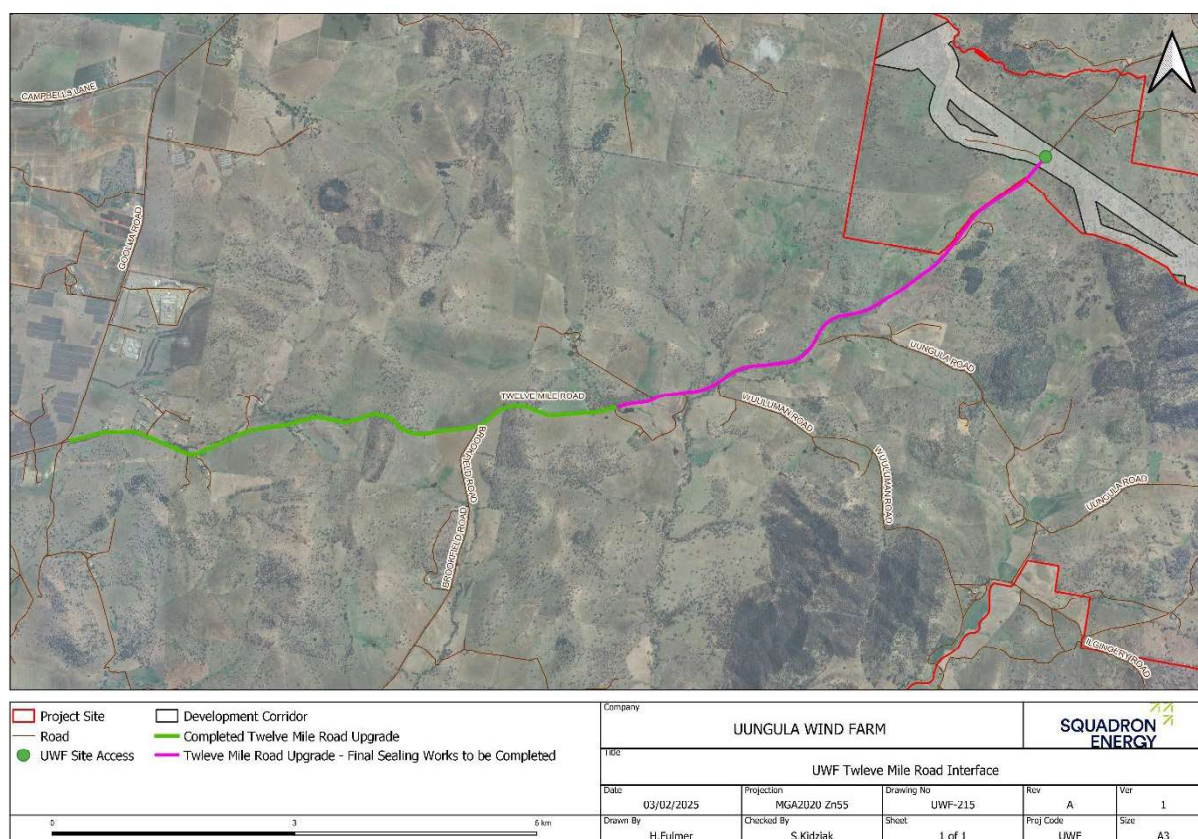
Overview of the completed Twelve Mile Road upgrade works and proposed section to overlap with TransGrid's construction activities.
